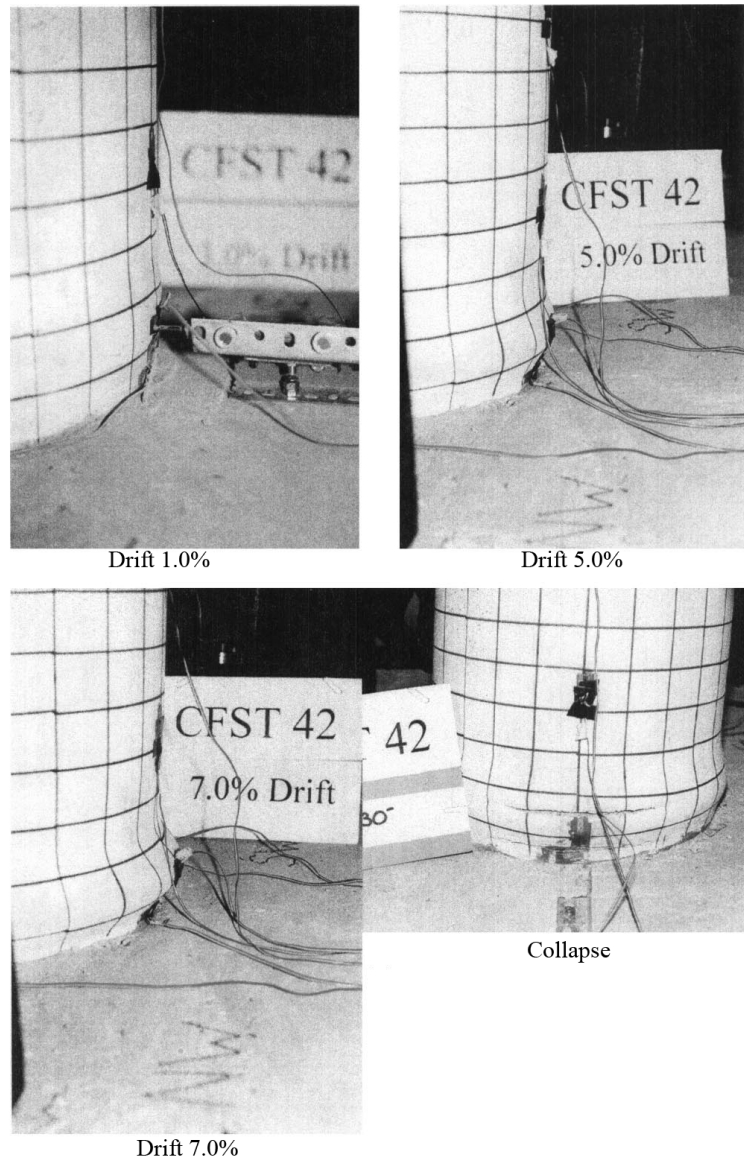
Failure mode of fully concrete-infilled CFT columns subjected to axial force and lateral cyclic load (Marson and Bruneau 2004)
